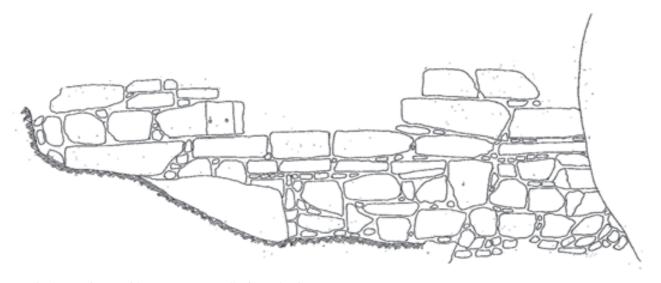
Elevation drawing of the upper east-west Wall B (L. Karlsson).
